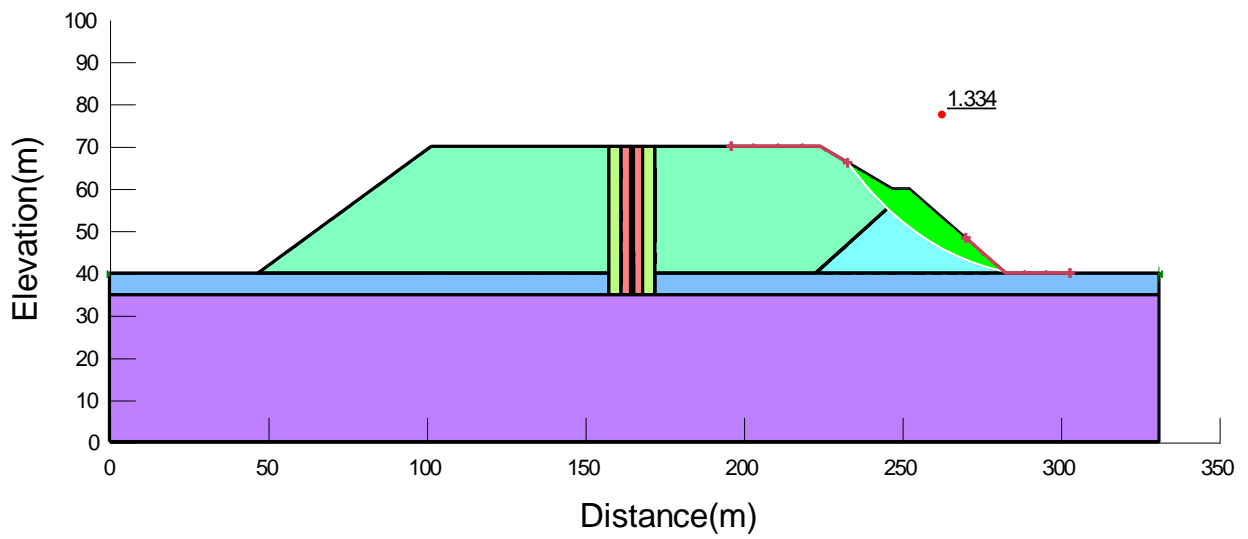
6: Slope stability during construction with Earthquake AC (D/S)
